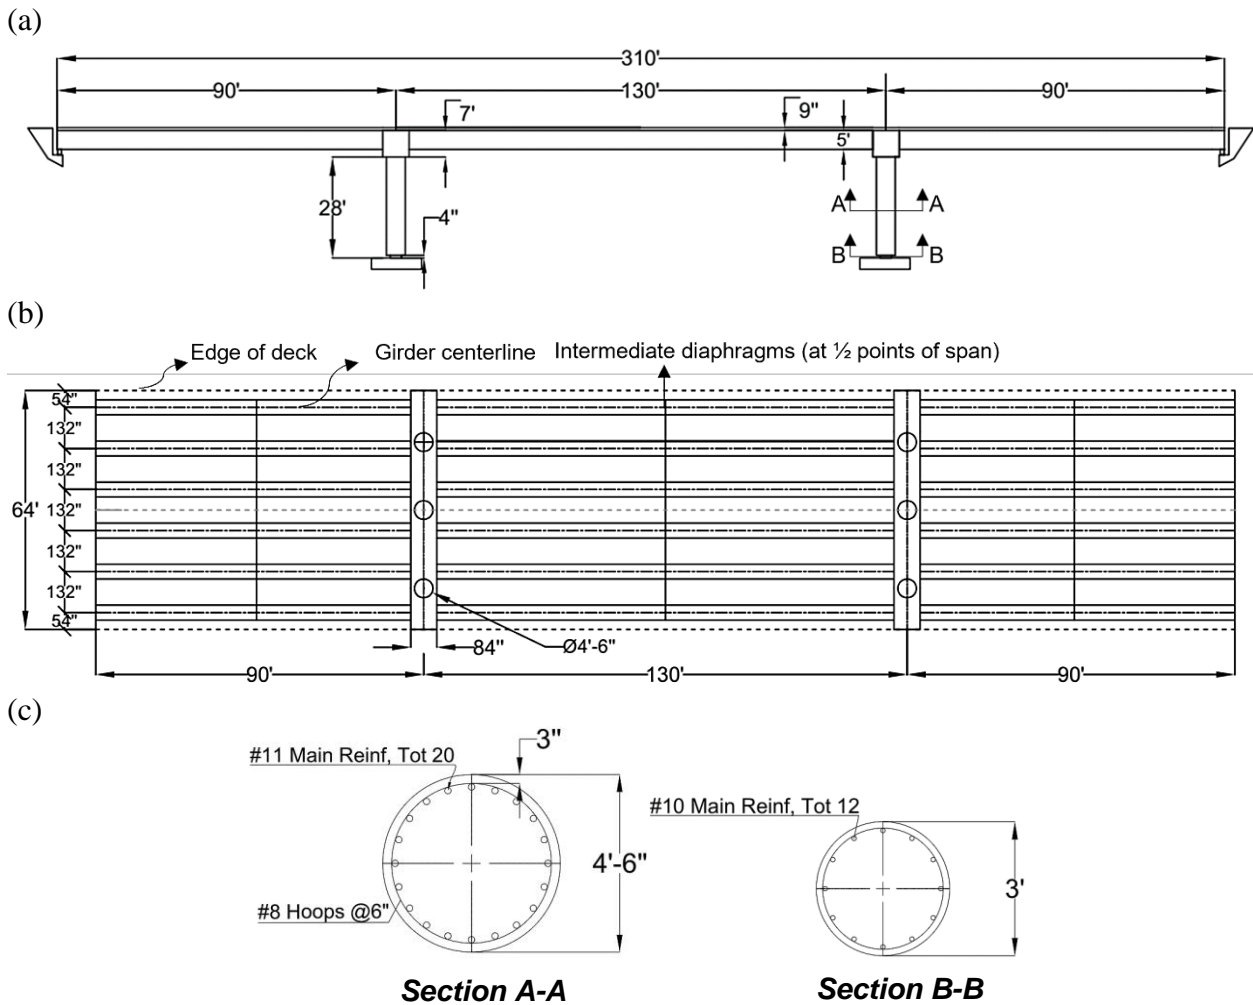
10. Elevation view of the draft version of the bridge (Preliminary structural drawings by Caltrans)
